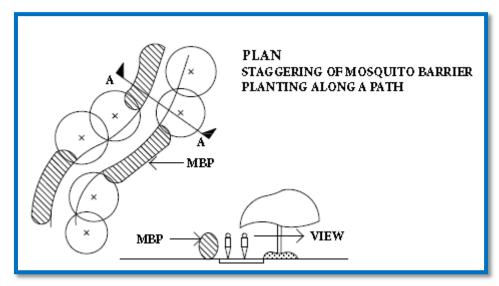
Examples of mosquito barrier planting (MBP) in a landscaped area.
